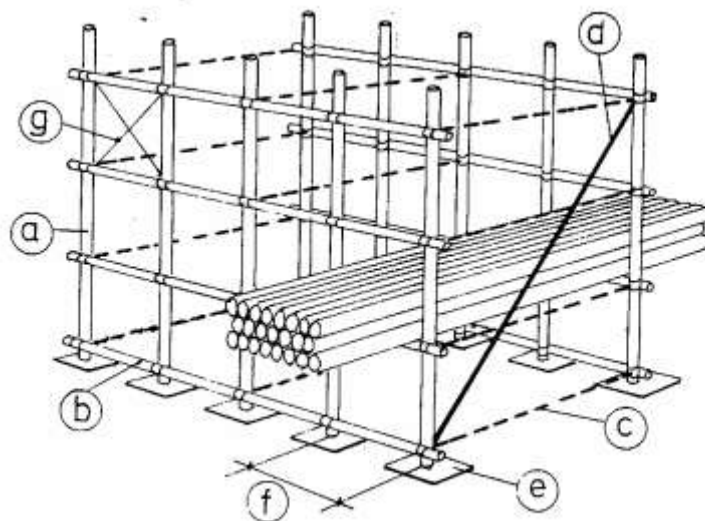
Structure to support long loads: a) jamb, b) stringer, c) crossbar, d) diagonal, e) foot, f) body, g) pigeonhole. Source: ([Maul03], p.175)
